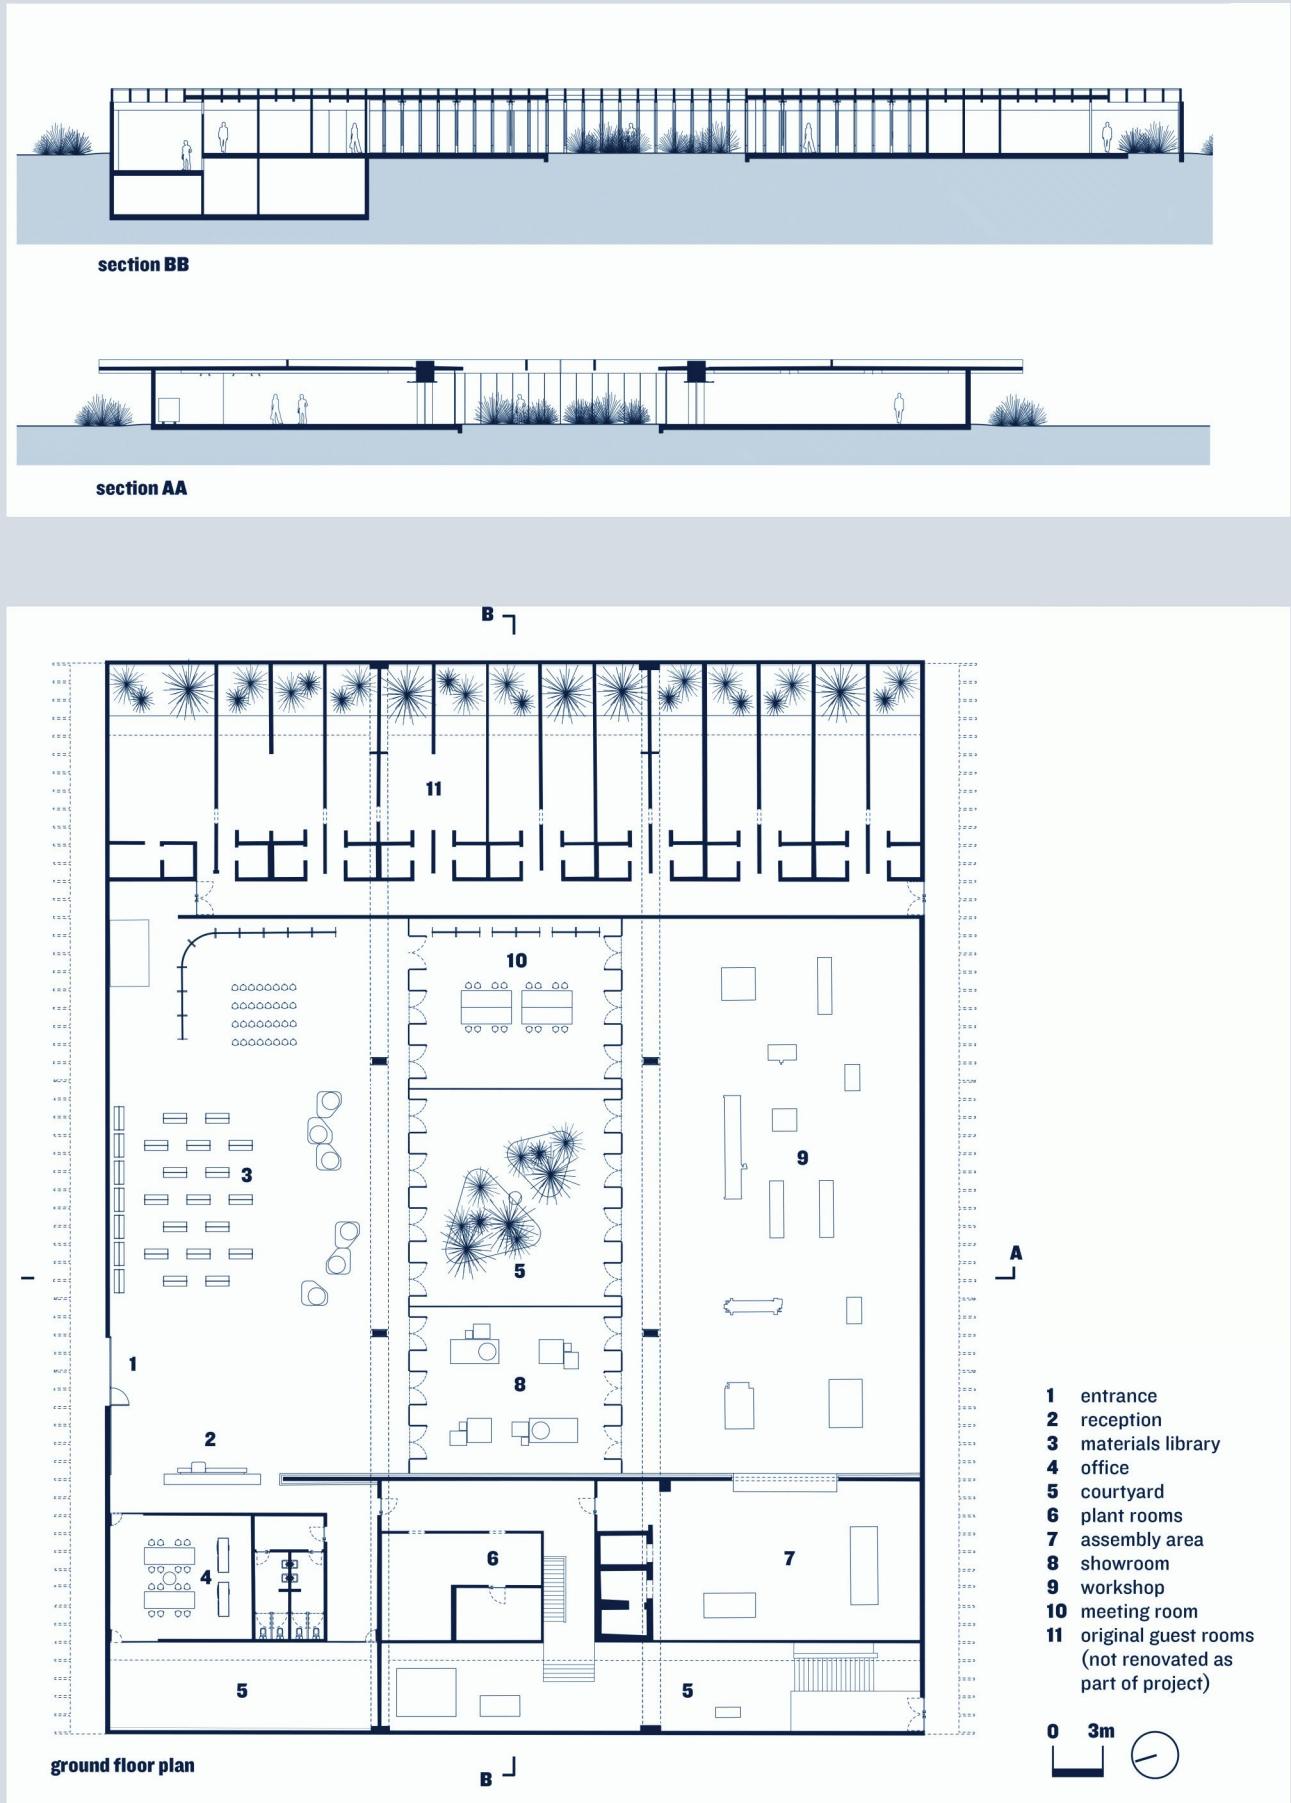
Plan and sections of the guesthouse after its rehabilitation.
